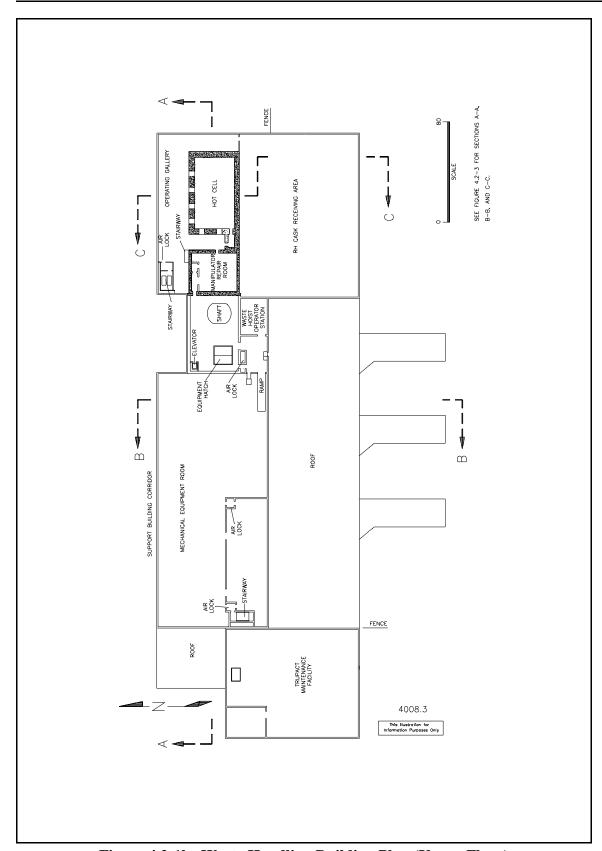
, Waste Handling Building Plan (Upper Floor)
